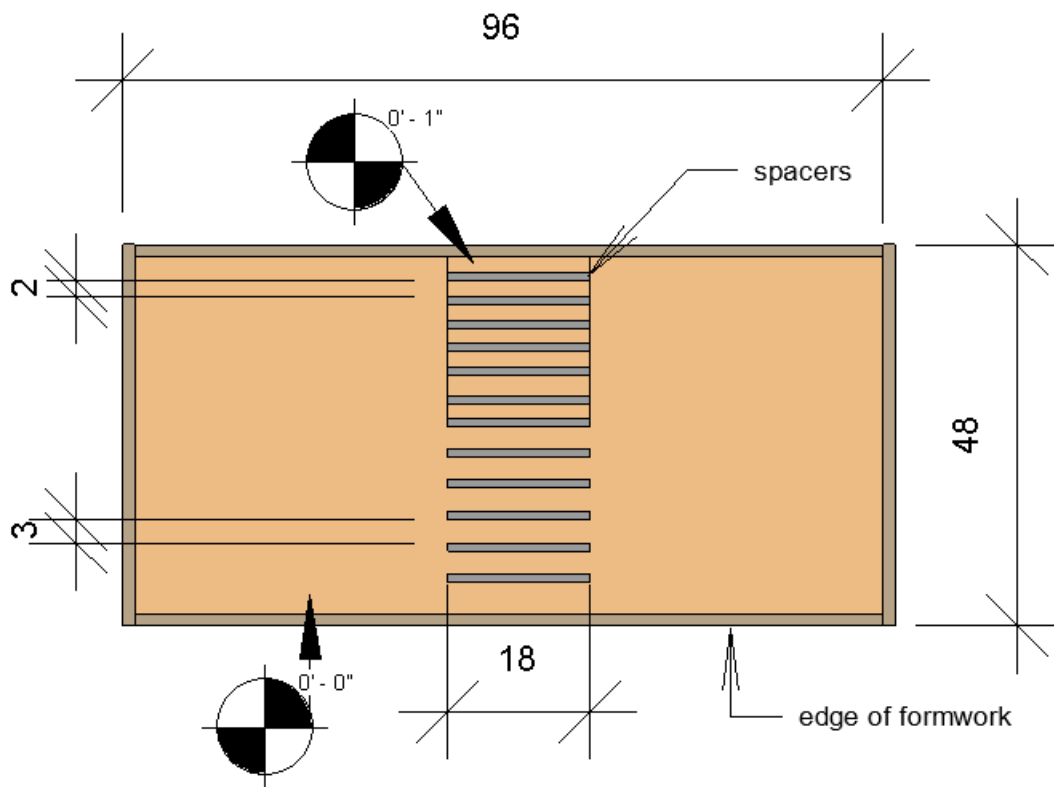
Plan View of Formwork (F1 and F2) with Dimensions in Inches
